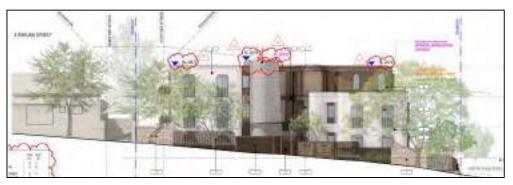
Extract of north elevation (Warung St) showing LEP 8.5m height line (Source: Squillace Architecture, Project No. HIG2307, Sept 2024)
